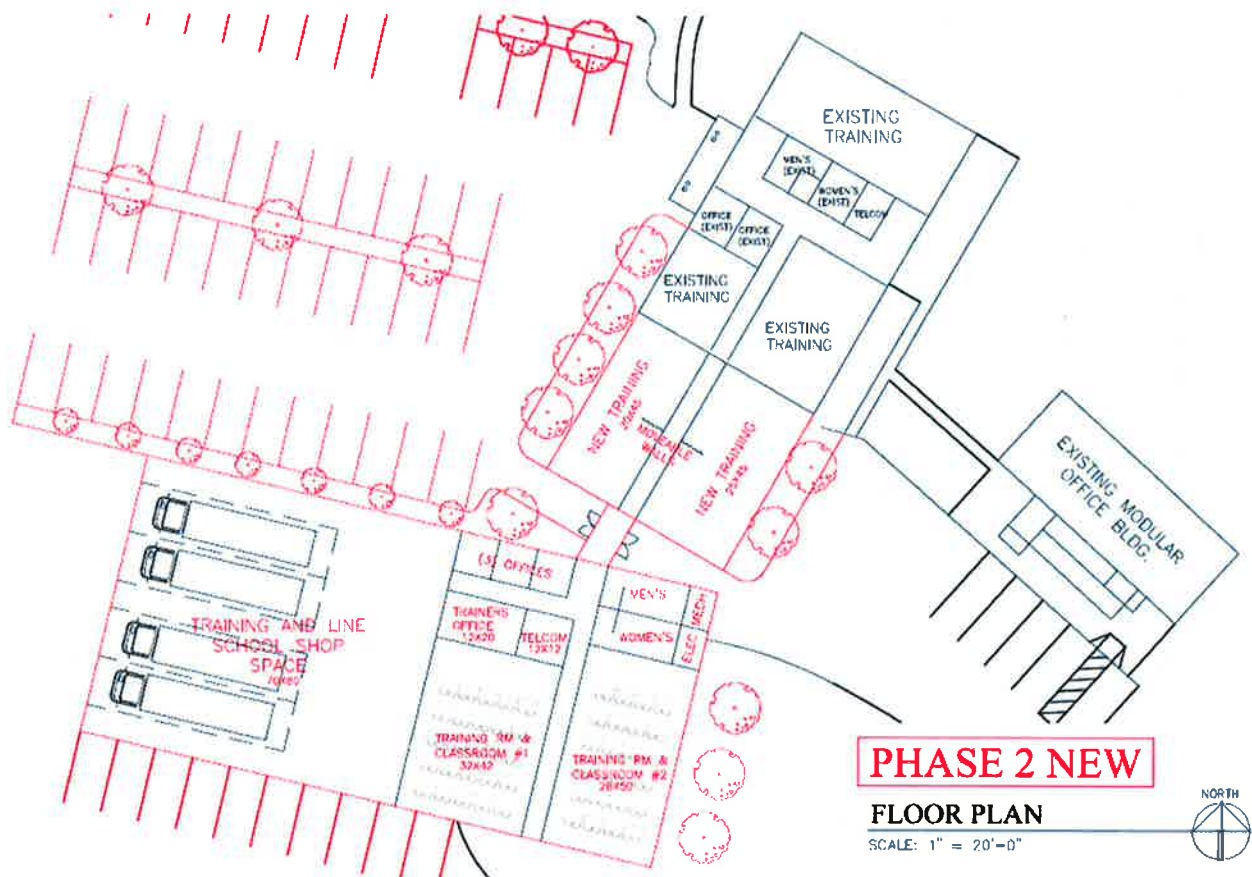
Original 2011 Proposed JSTC Training Facility Expansion
